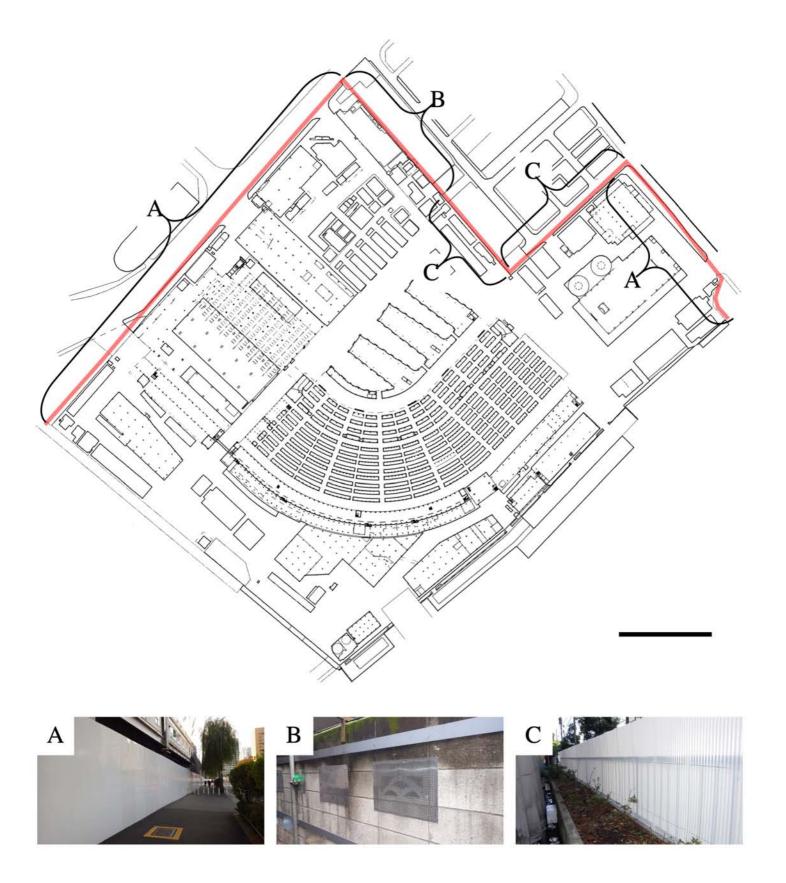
Isolating wall details. The horizontal bar indicates 100 m.
